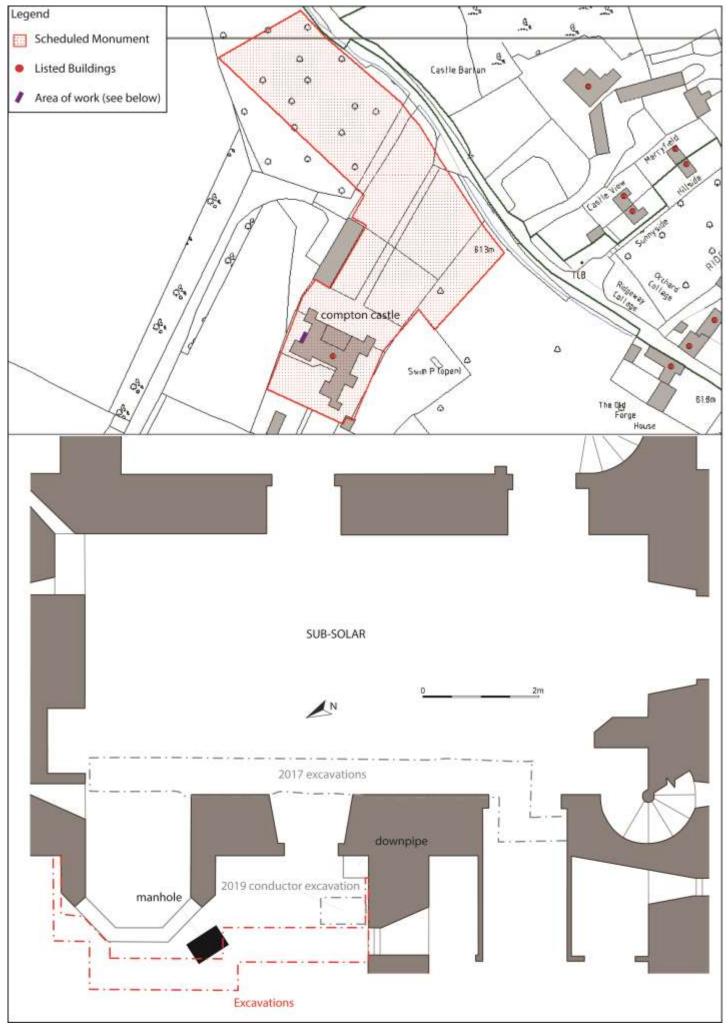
LOCATION PLAN, SHOWING THE AREA OF EXCAVATIONS.
